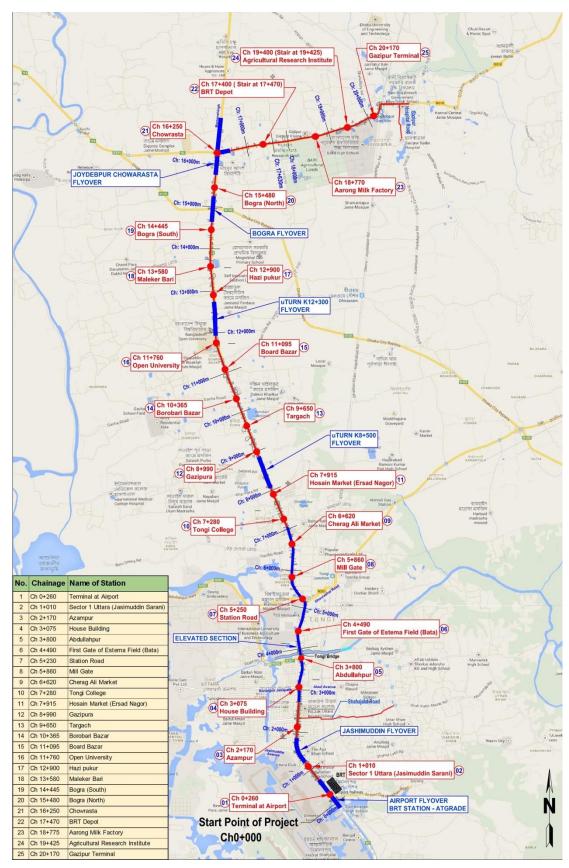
Proposed BRT – Gazipur to Airport Roundabout
